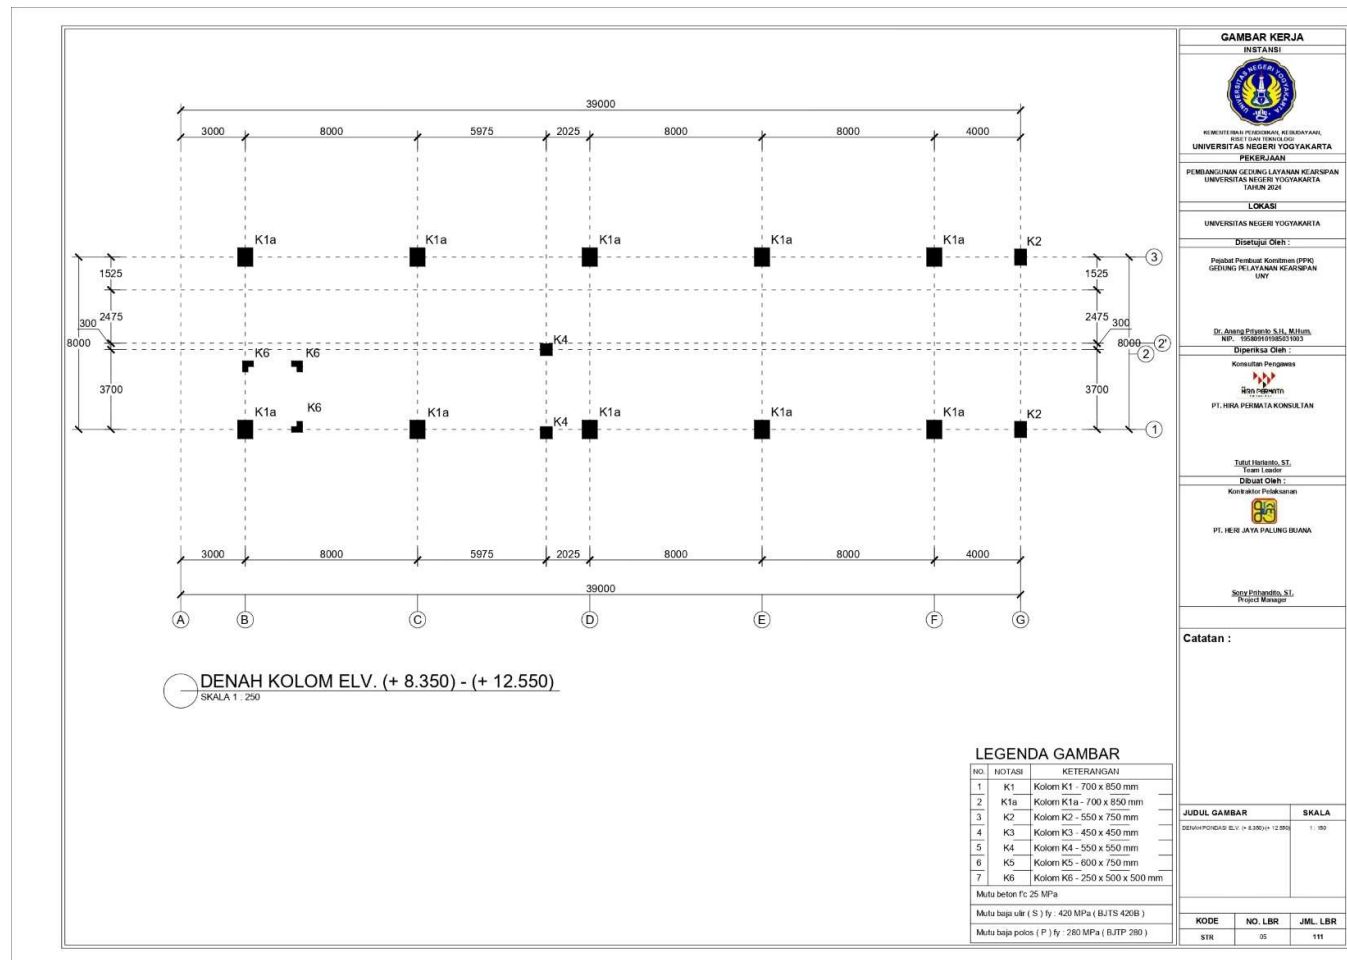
3 Column Site Plan of Elv. (+8.350) – (+12.550)
